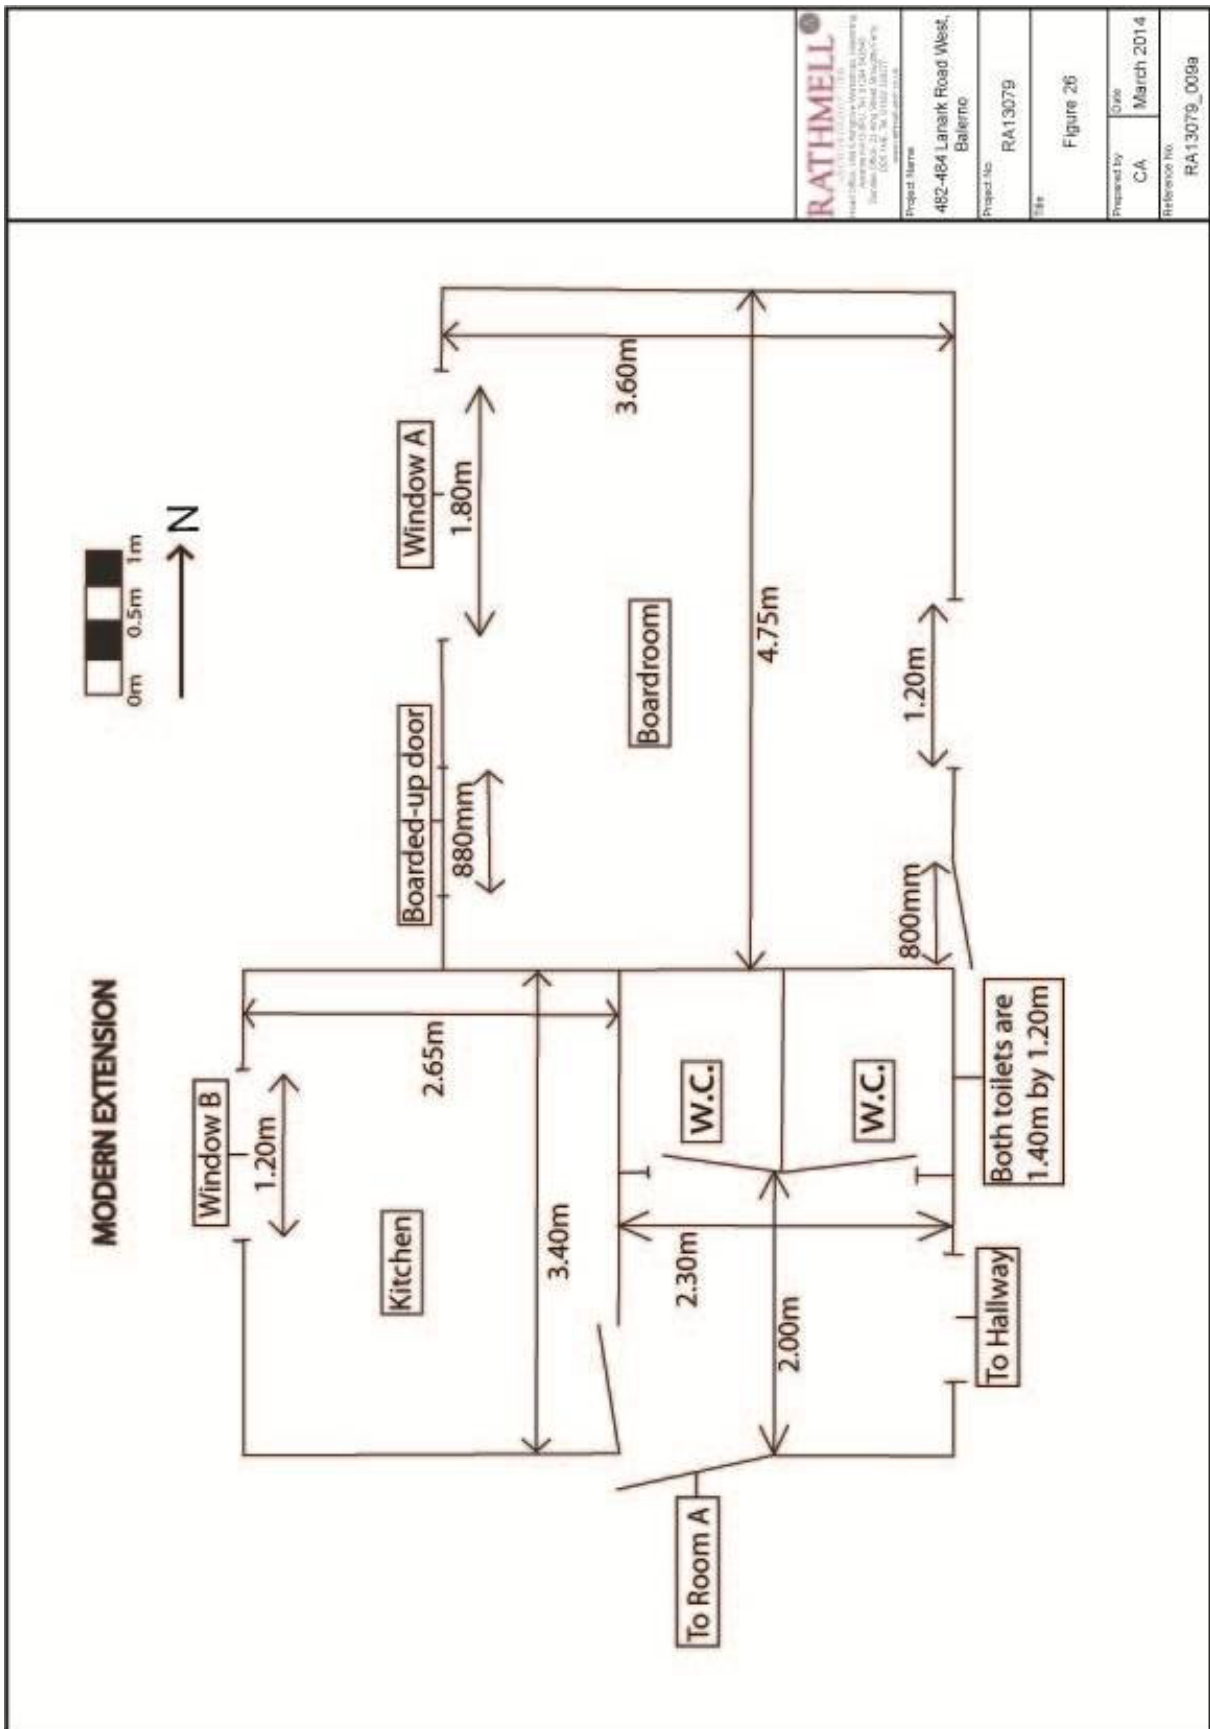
Modern Extension - Plan of hallway, Kitchen and Boardroom.
